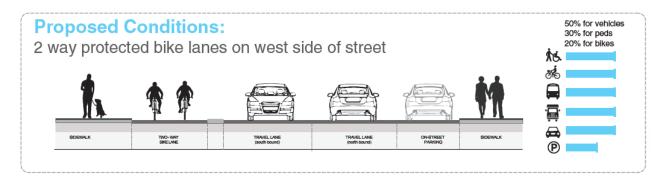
Proposed conditions for Wharf Street, 2 way protected facility on West side
